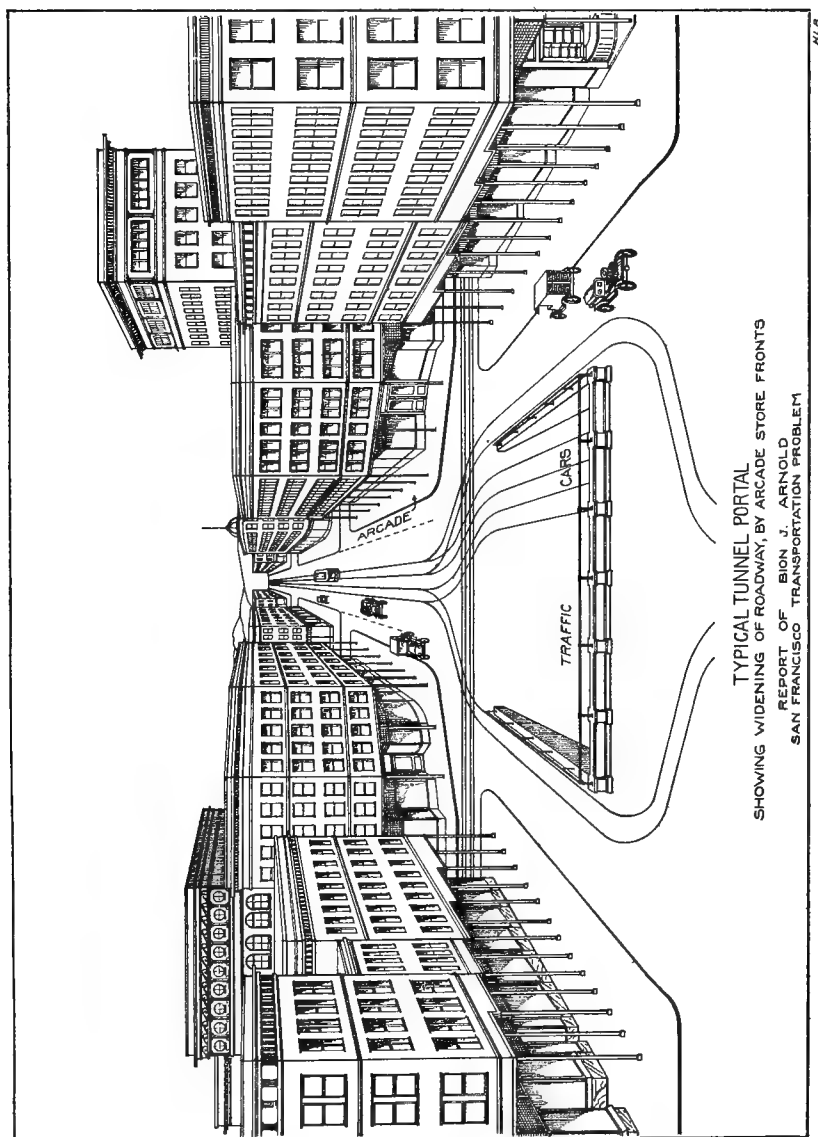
PERSPECTIVE OF ARCADE STORE FRONTS AND TUNNEL PORTAL
